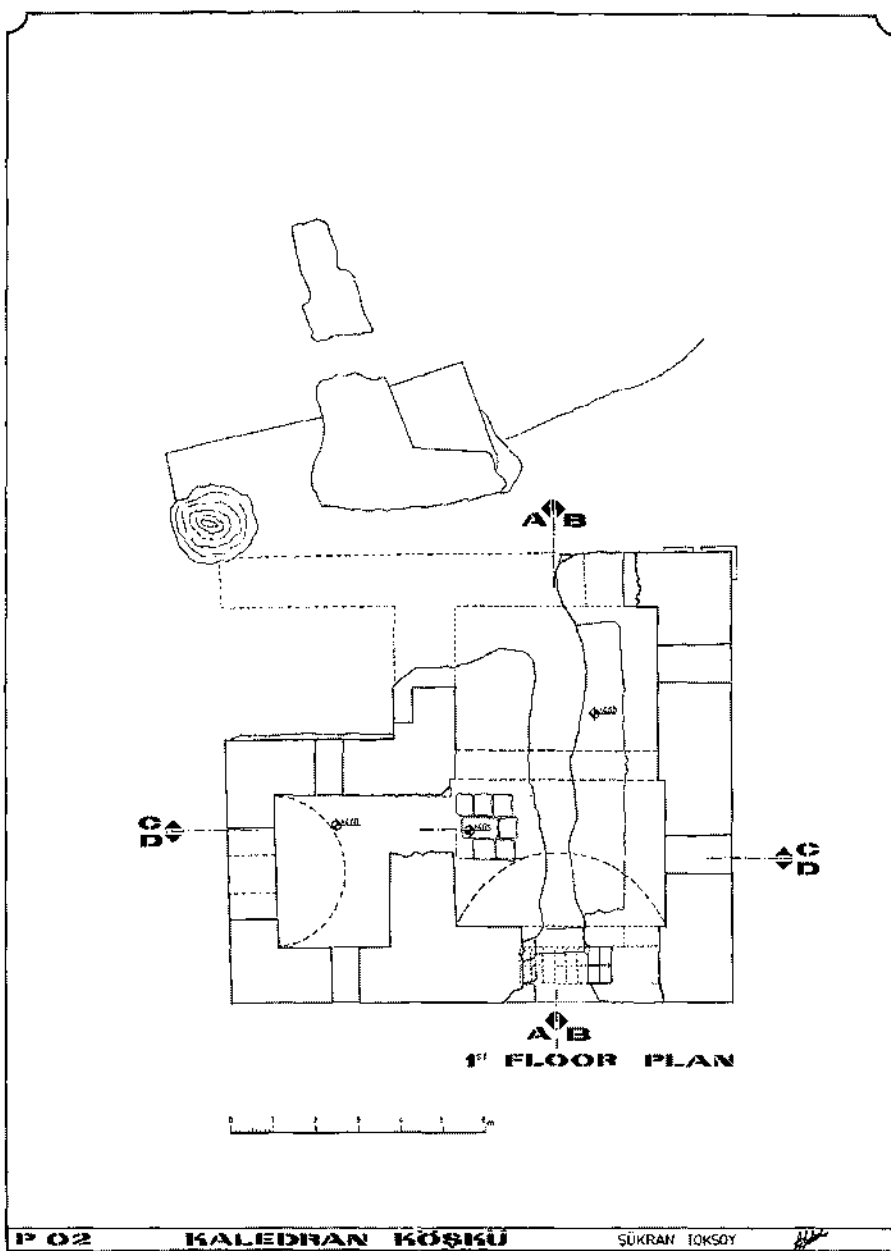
Kaledran kiosk, Kaledran, plan, first floor
